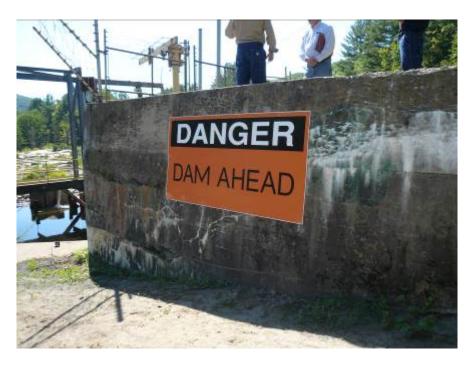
Warning signage at north dam abutment (photo taken adjacent to impoundment boat launch area).
